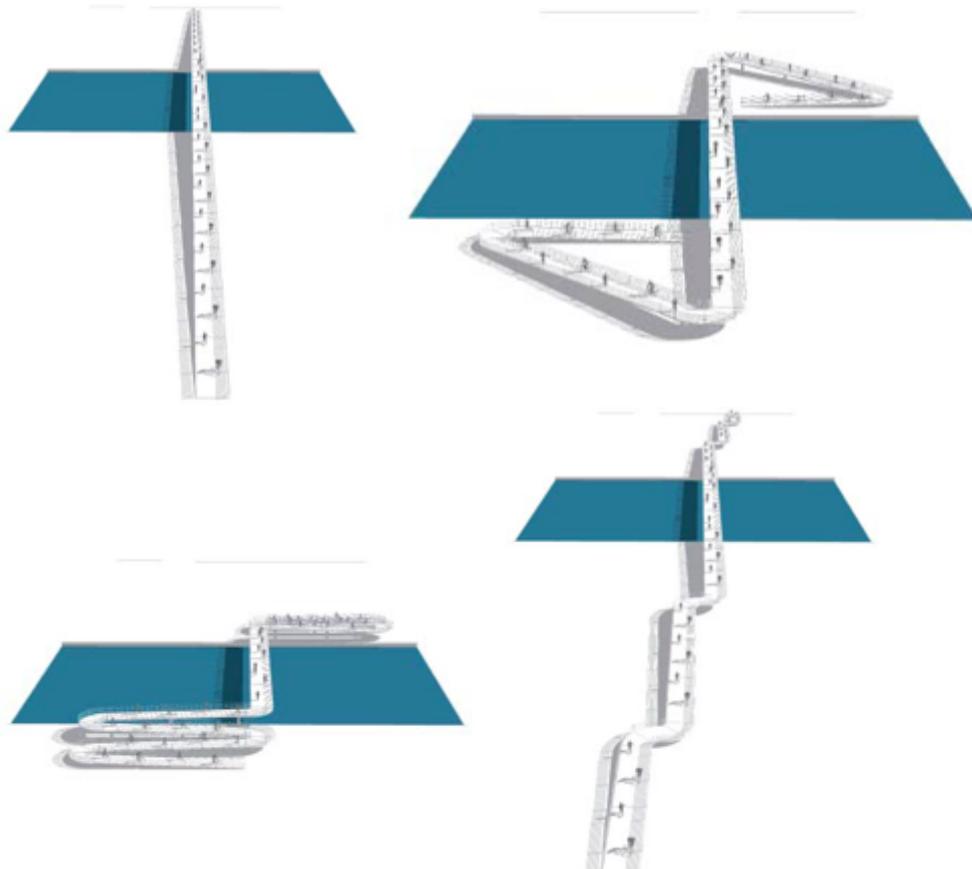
Extracts from the ramp alignment option development undertaken for Christchurch Bridge showing the in-line ramp, switchback, serpentine/offset and helical ramp arrangements.
